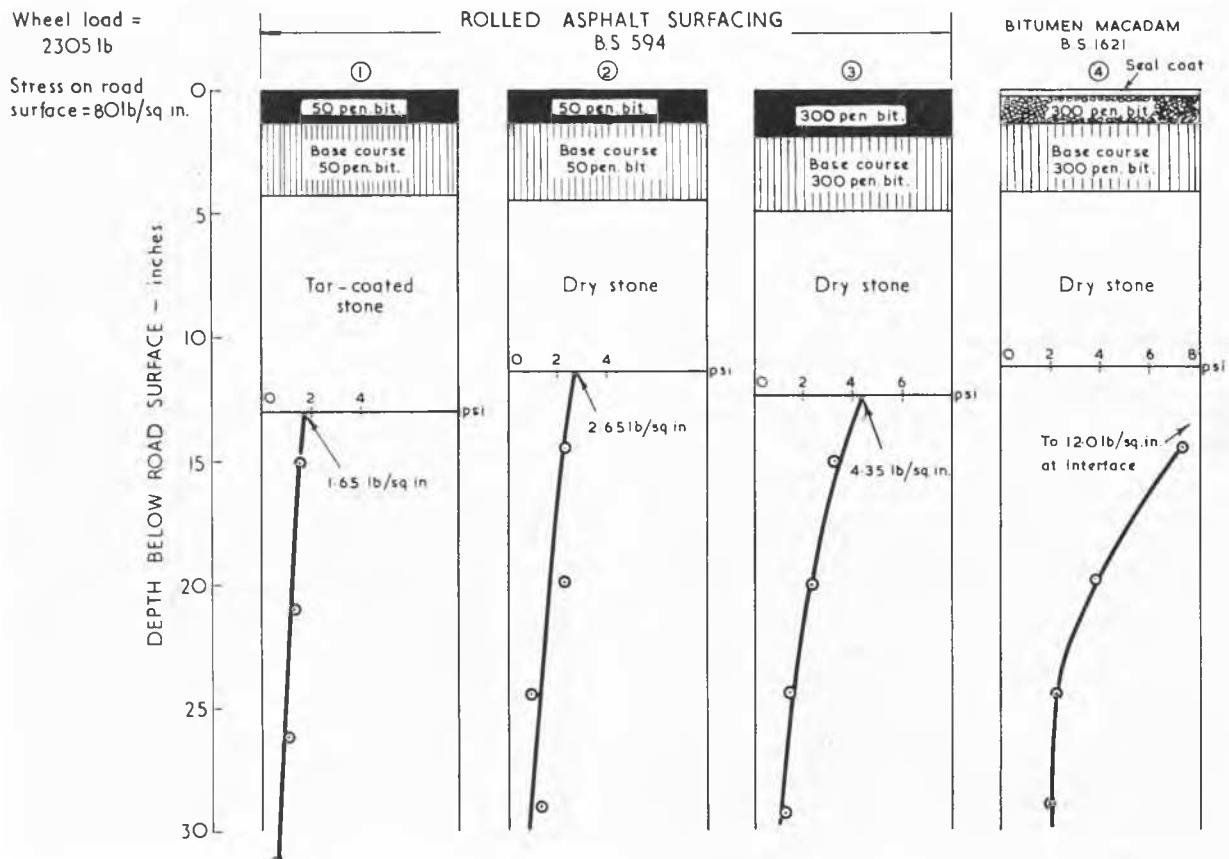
Effect of type of road structure on vertical stress on subgrade.
